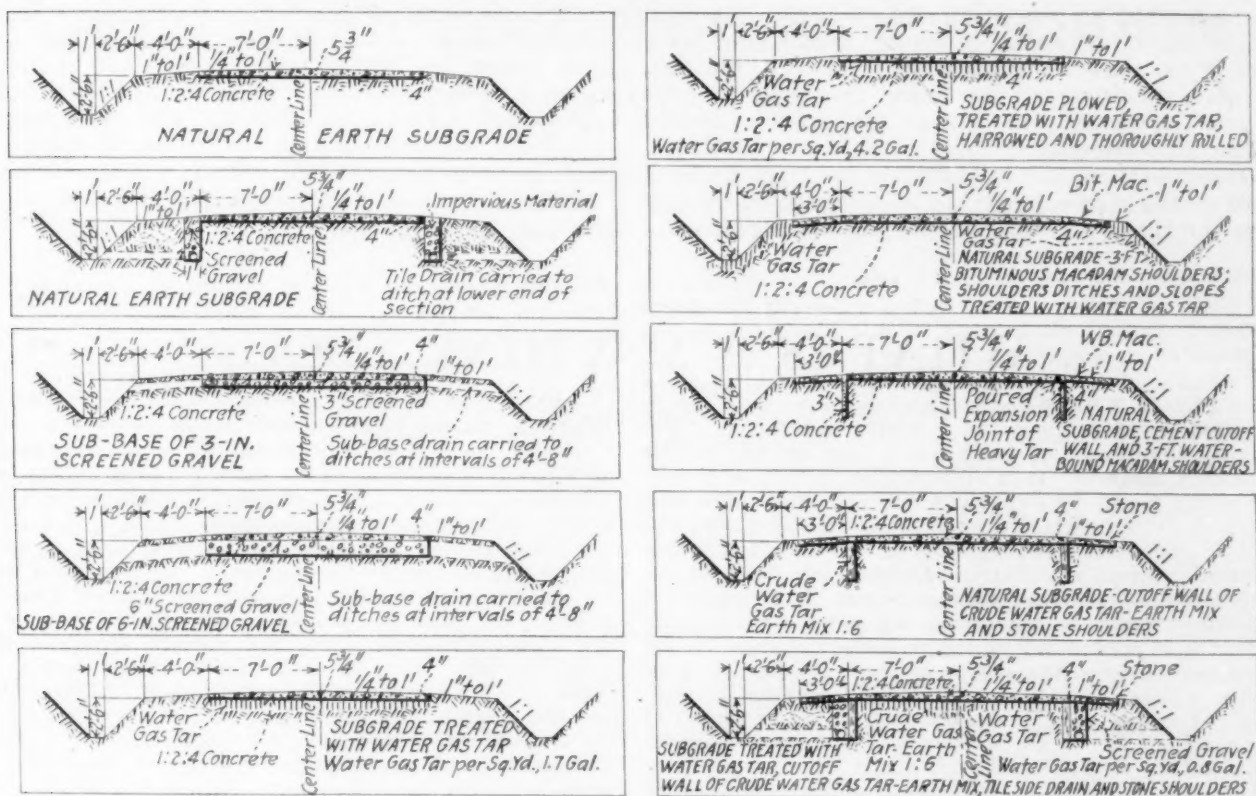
VARIOUS FORMS OF ROAD CONSTRUCTION WHICH HAVE BEEN TESTED AT THE ARLINGTON FARM OF THE BUREAU OF PUBLIC ROADS TO DETERMINE THE PRINCIPLES UNDERLYING THE DRAINAGE OF SUBGRADES
